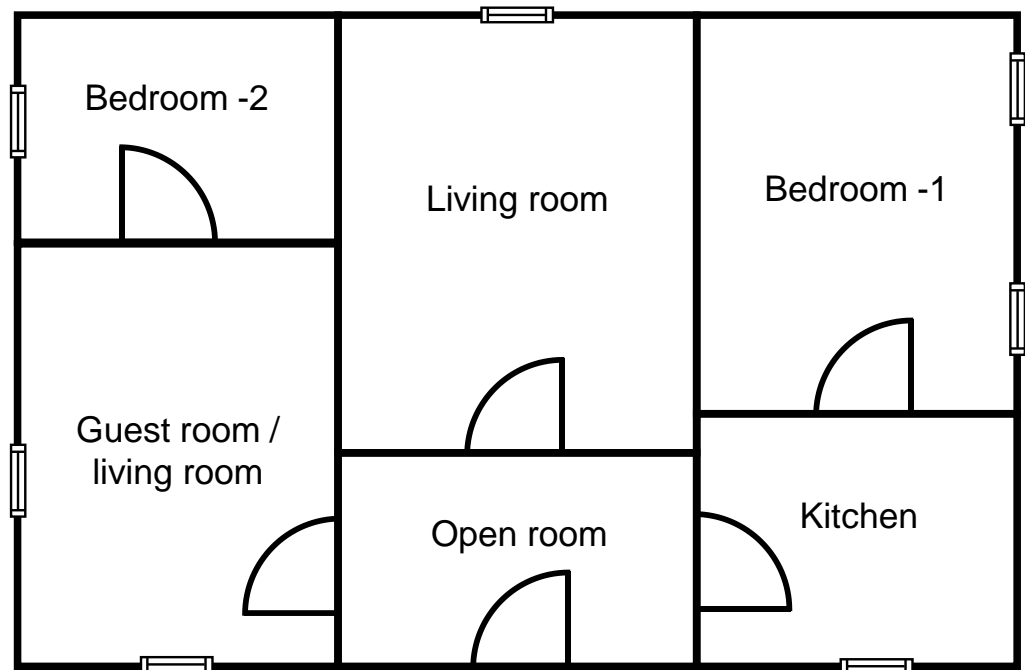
Typical architectural plan of rural Kyrgyz house (own illustration based on the site visit).
